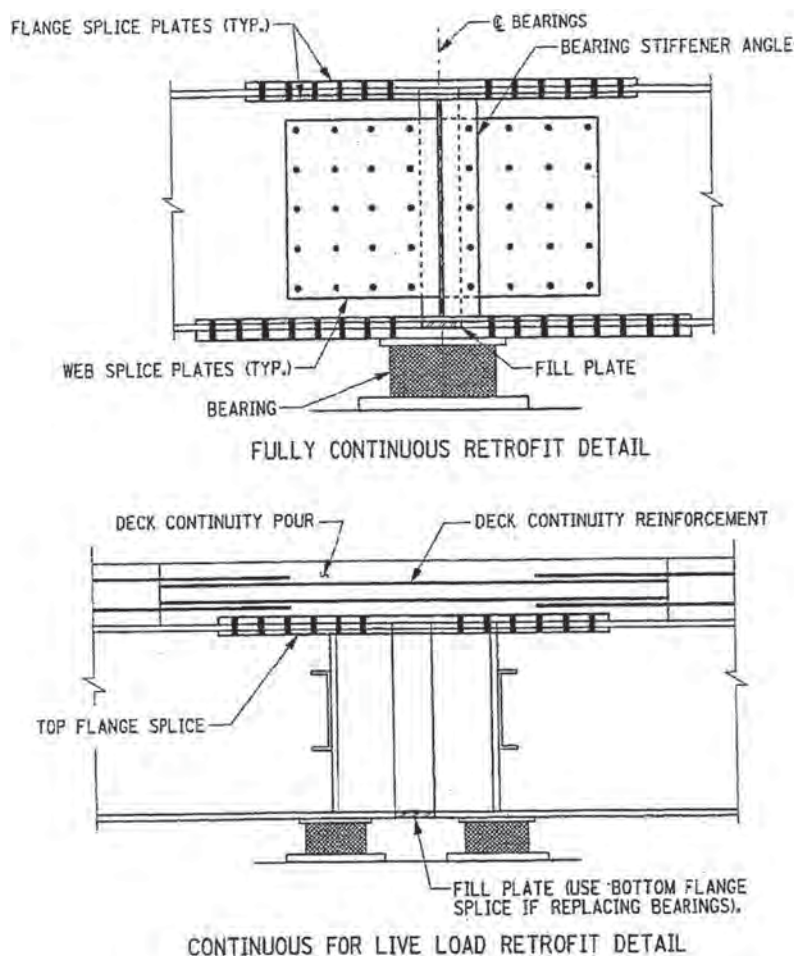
Typical details for converting simple-span beams to continuous from the NYSDOT Bridge Design Manual (2008).
